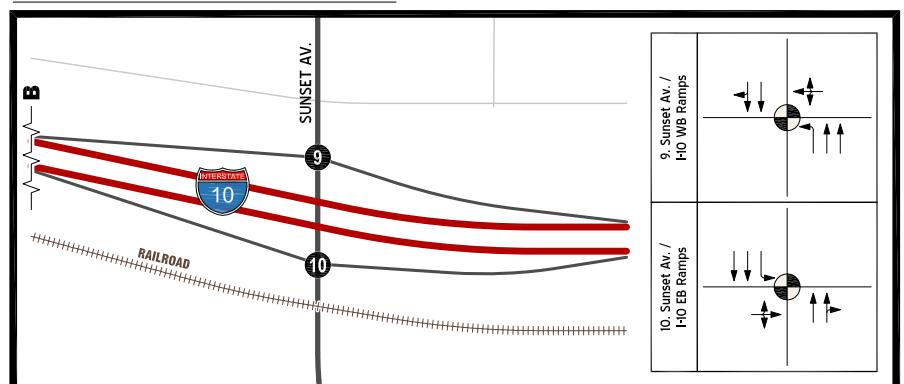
ALTERNATIVE 2 (HOOK RAMPS) INTERSECTION TRAFFIC CONTROLS AND APPROACH LANES
